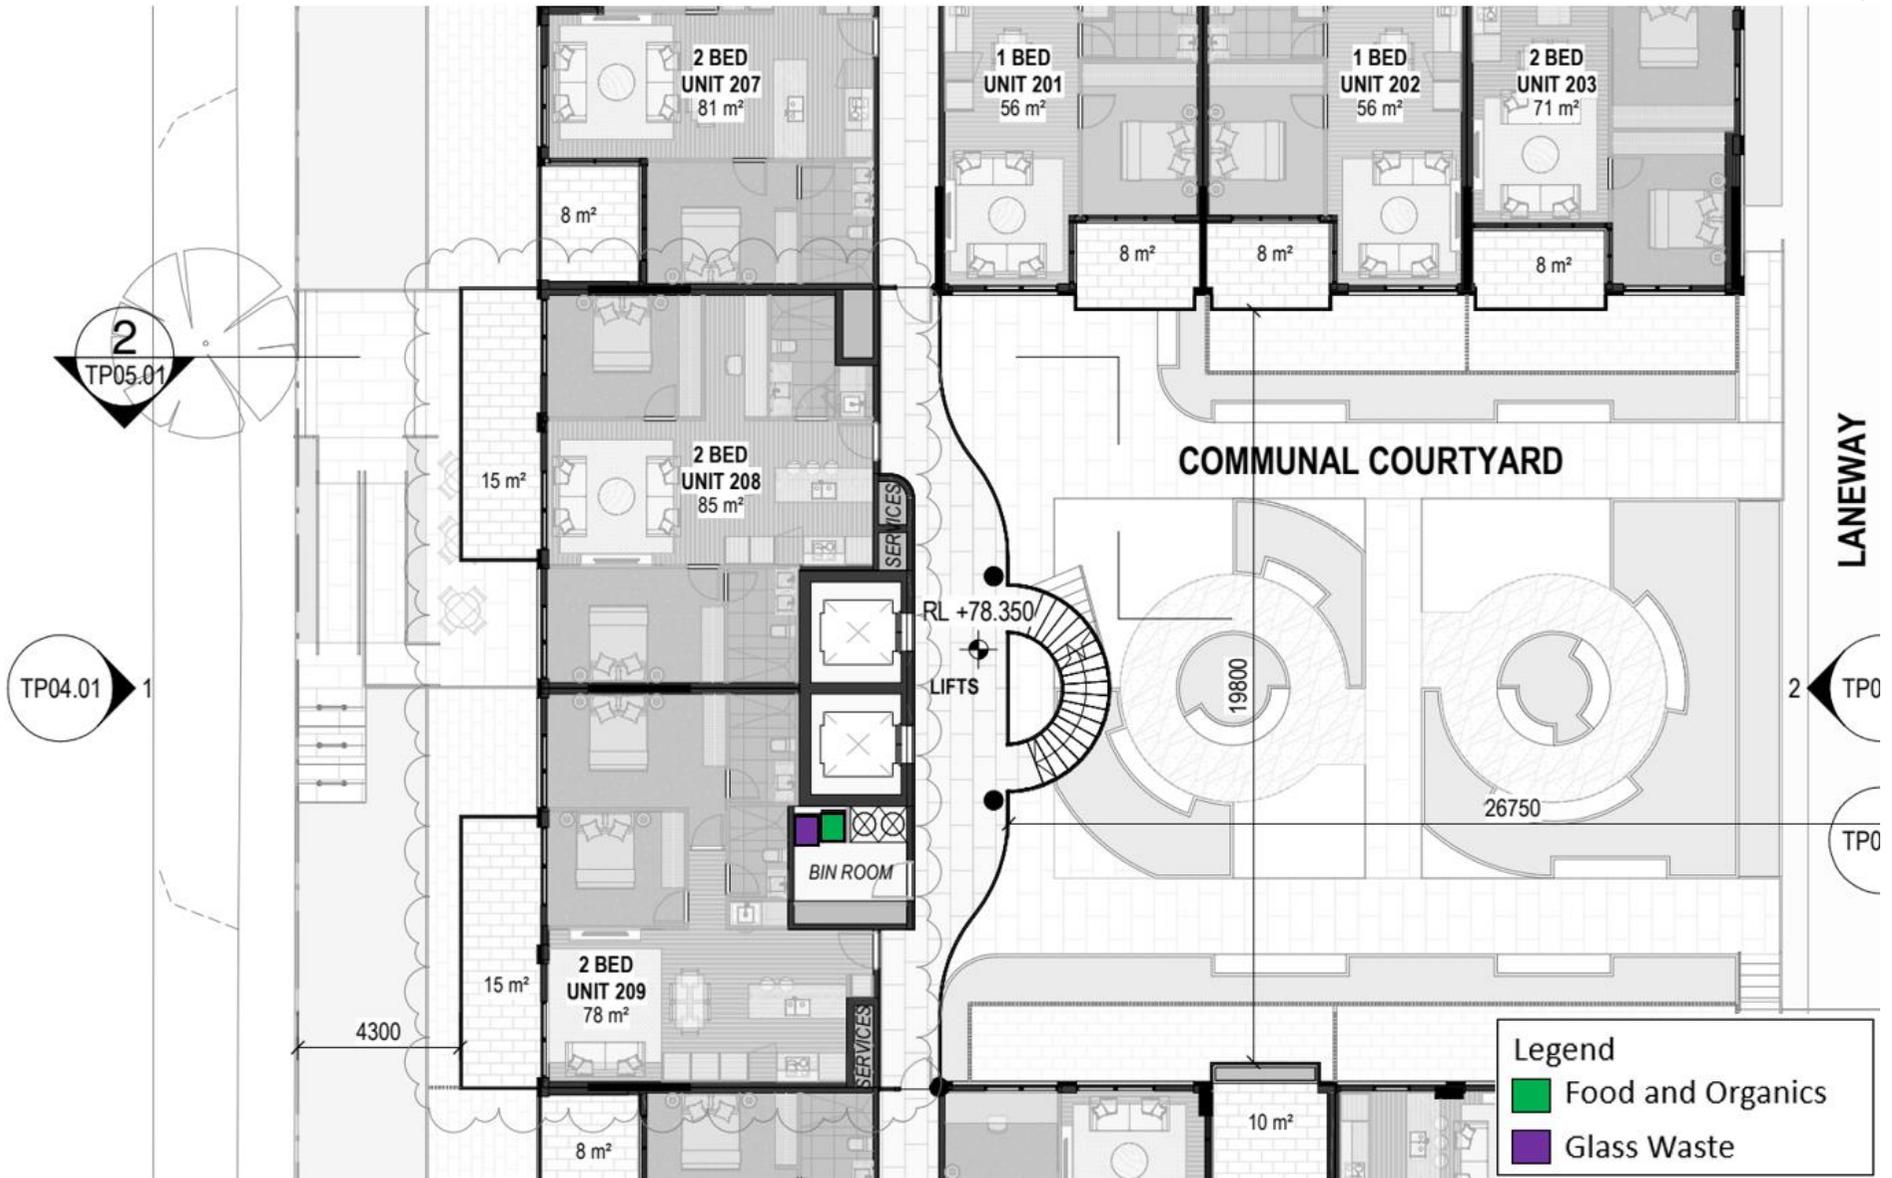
DEVELOPMENT PLAN – SECOND FLOOR BIN STORAGE AREA – FUTURE
